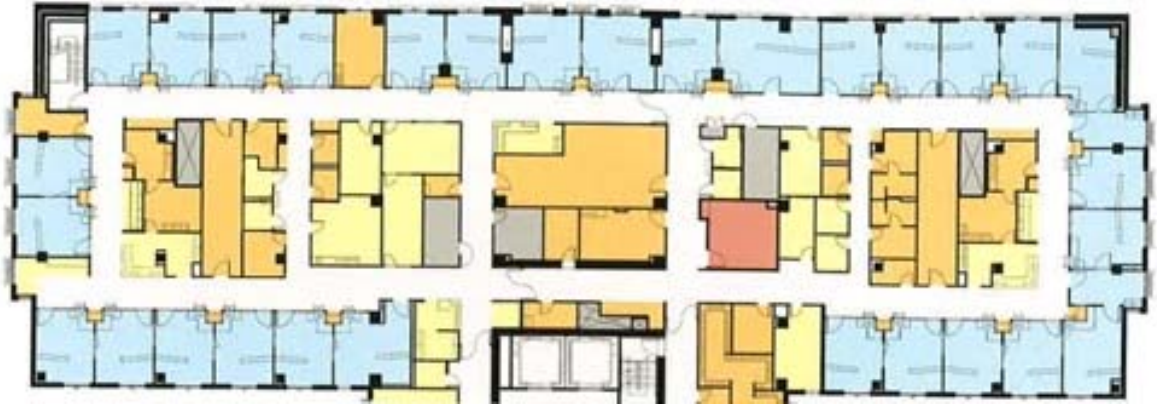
Loop with core design floor plan (Source: Shepley, 2014, p. 99)
